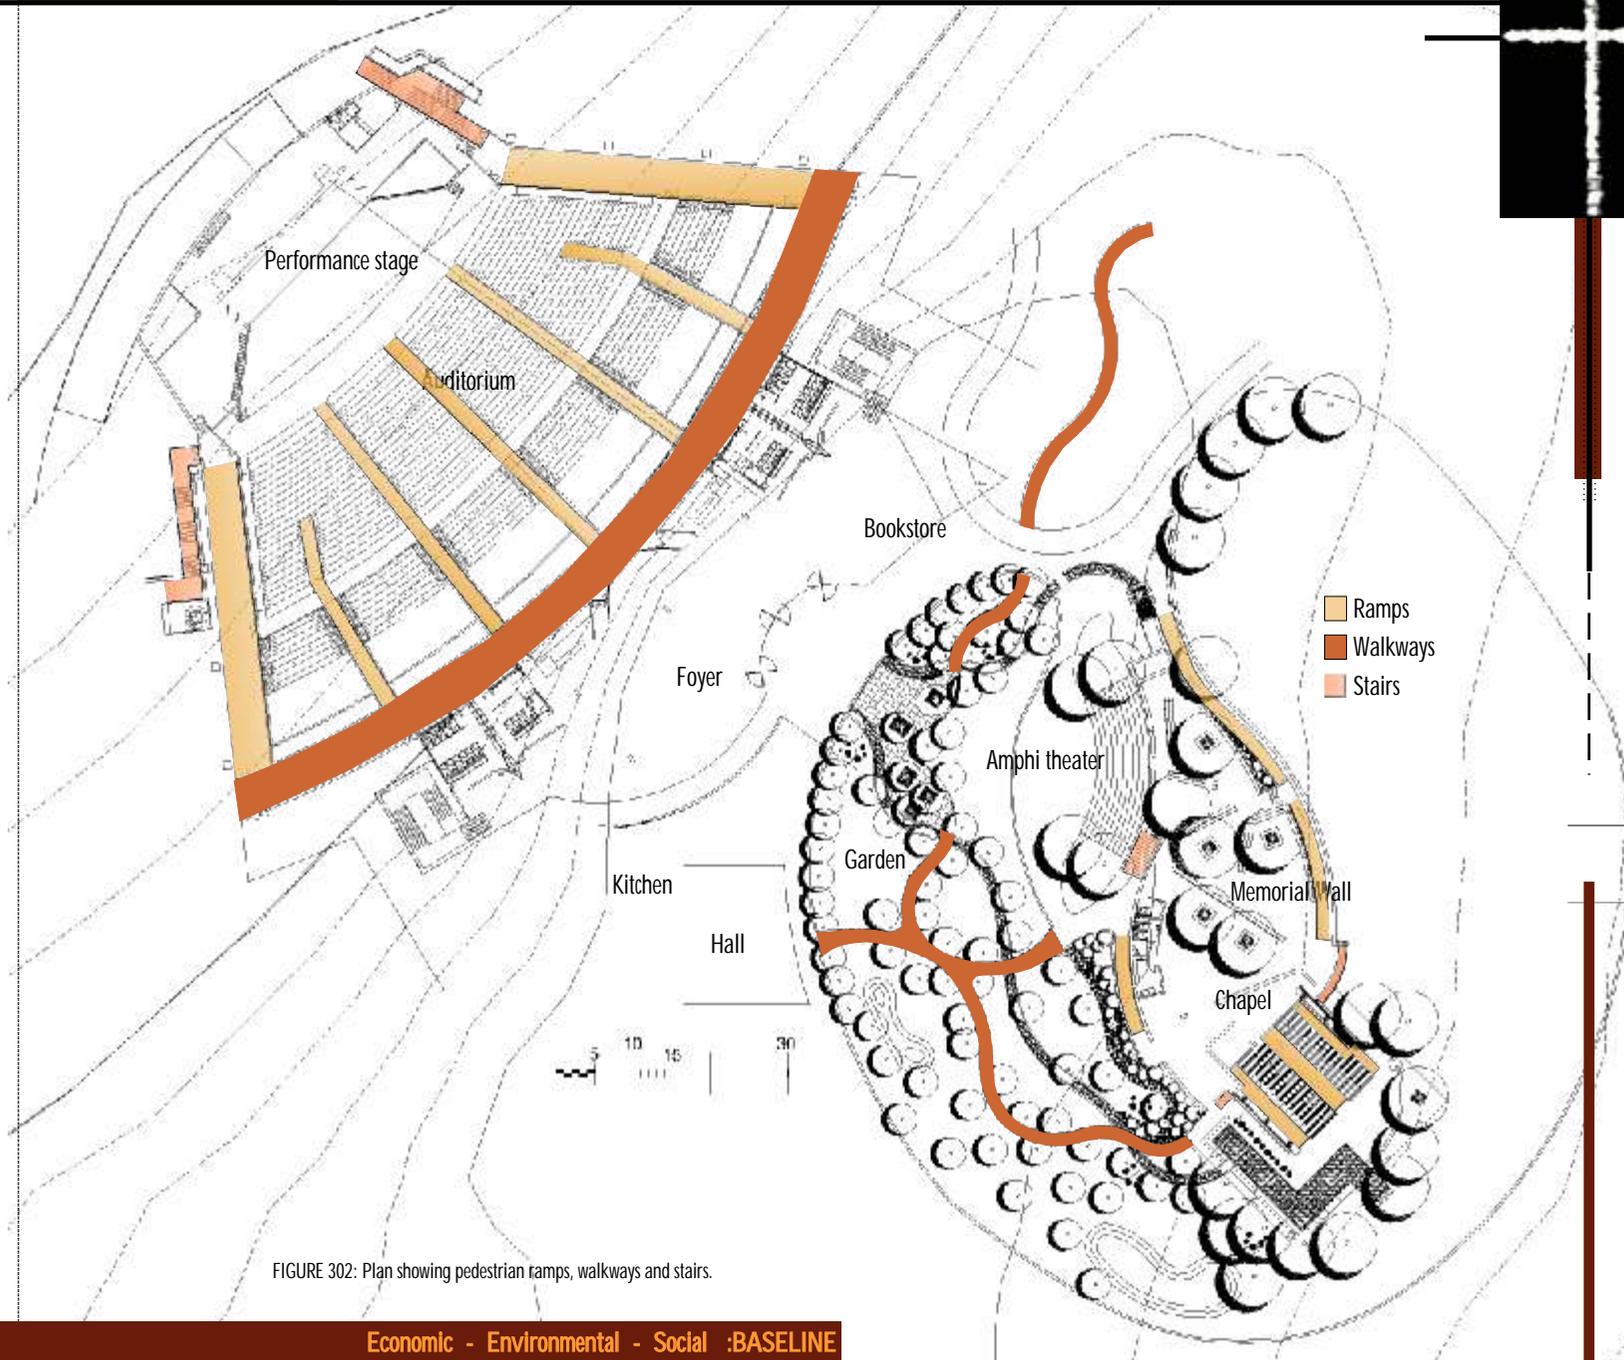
Plan showing pedestrian ramps, walkways and stairs.
